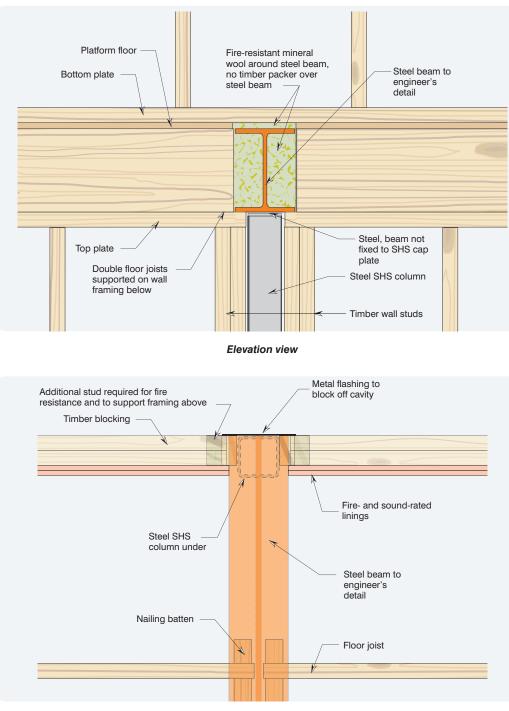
Steel beam and column housed in fire- and sound-rated wall – FRL 60 minutes.
